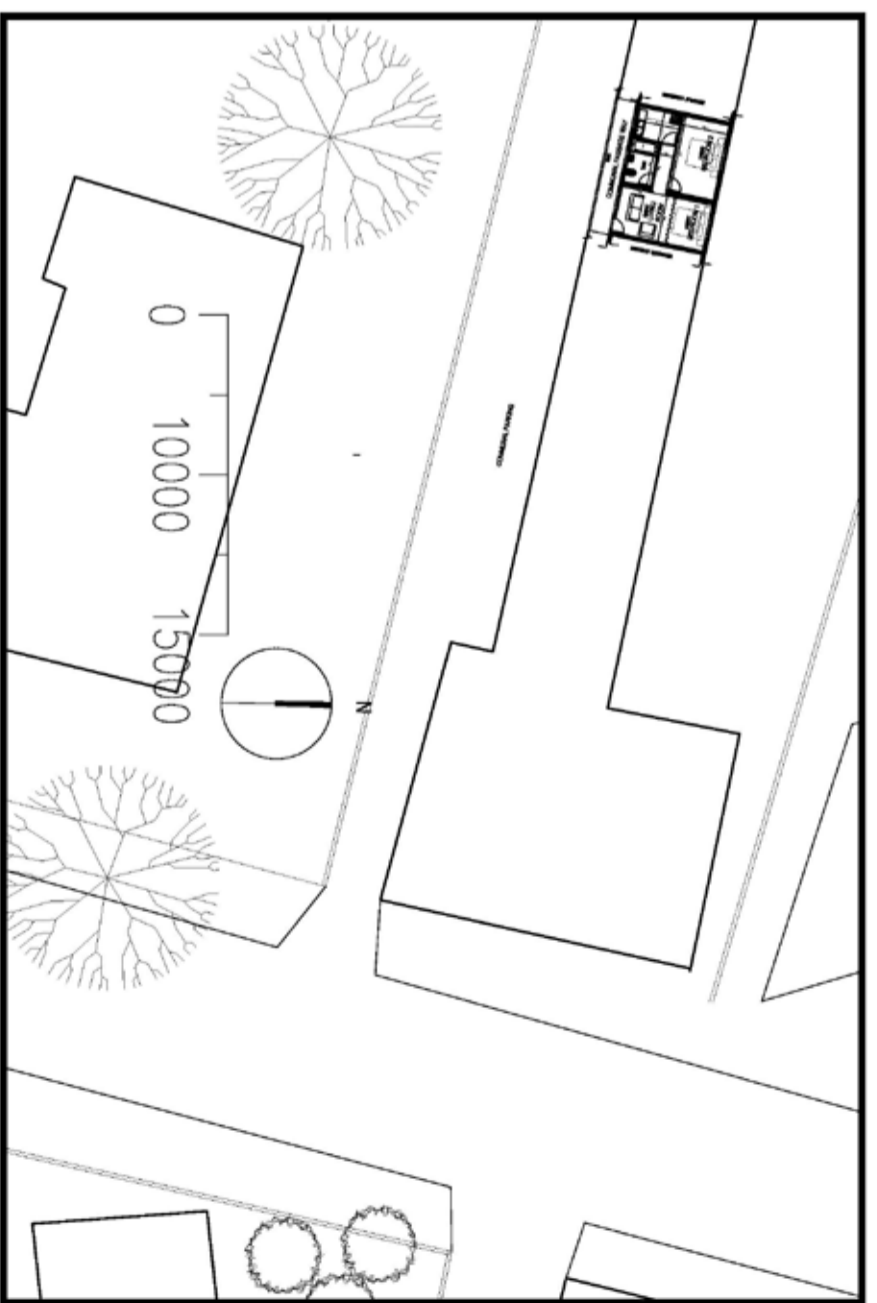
RSA House 2 - Floor plan, site plan and context plan
